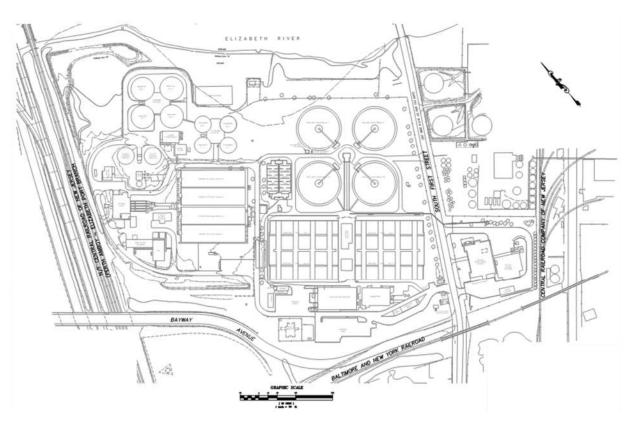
Plant Layout - JMEUC Wastewater Treatment Facility
